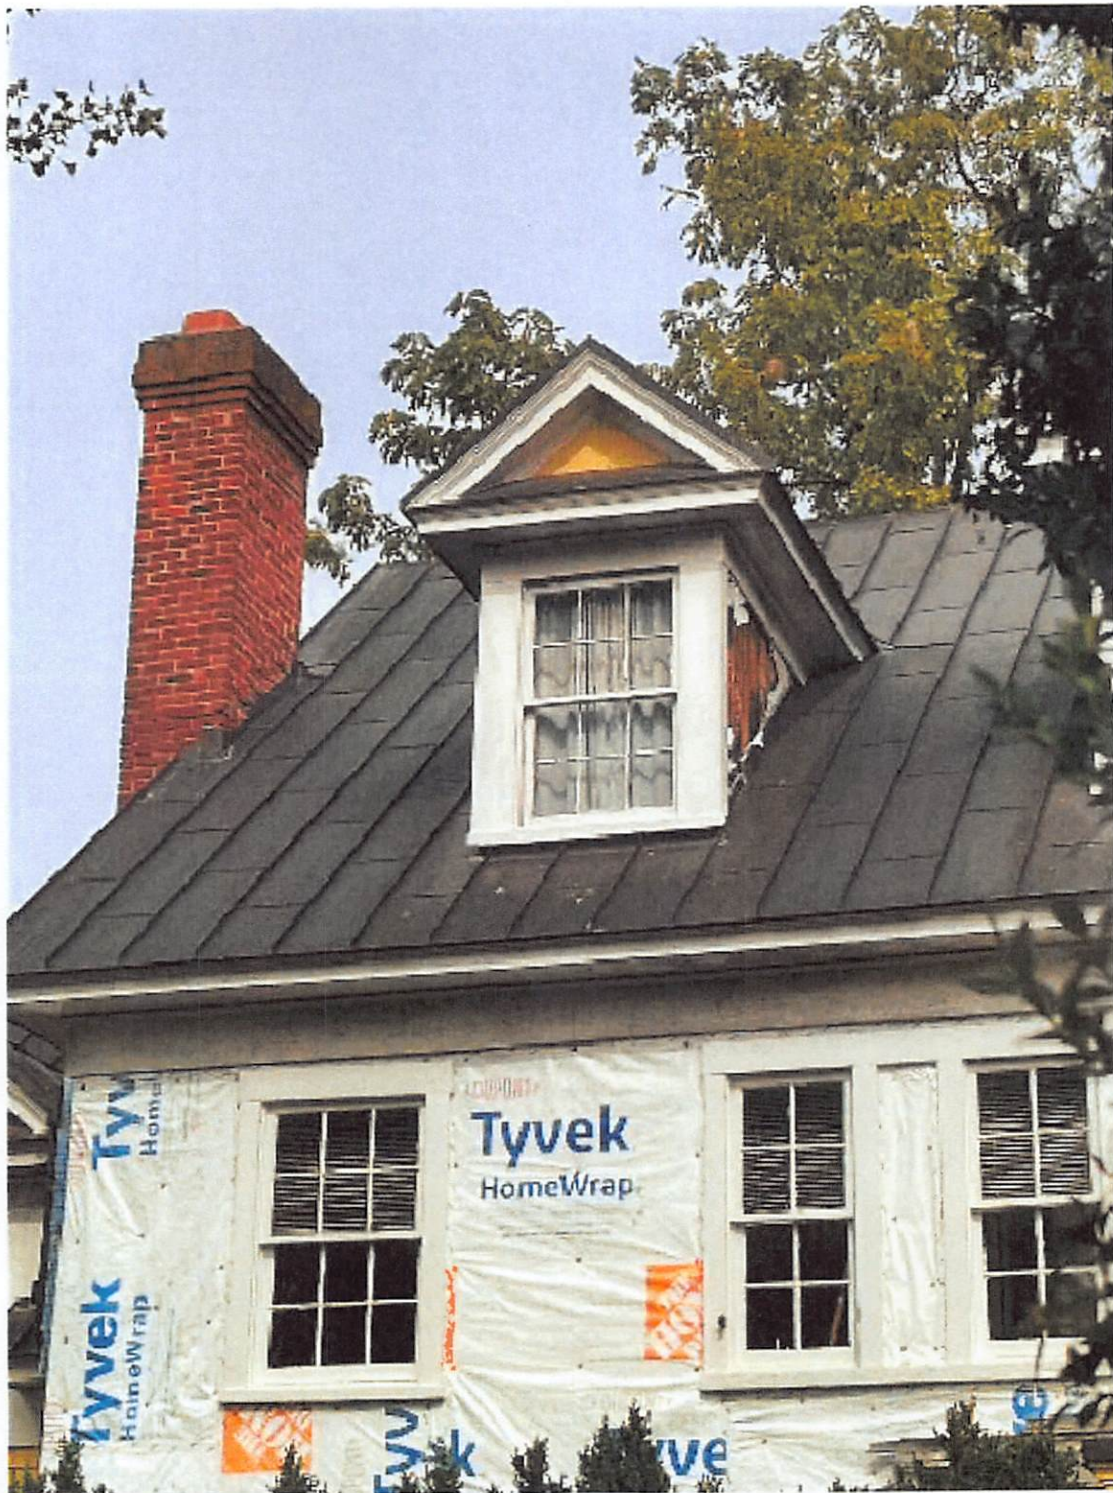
Shows faulty structural supports, inadequate roofing on right side, wood rot, and peeling paint.
